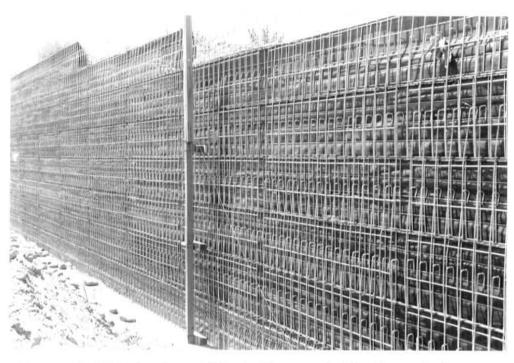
SE Embankment Prior to Placement of the Concrete Forms.
